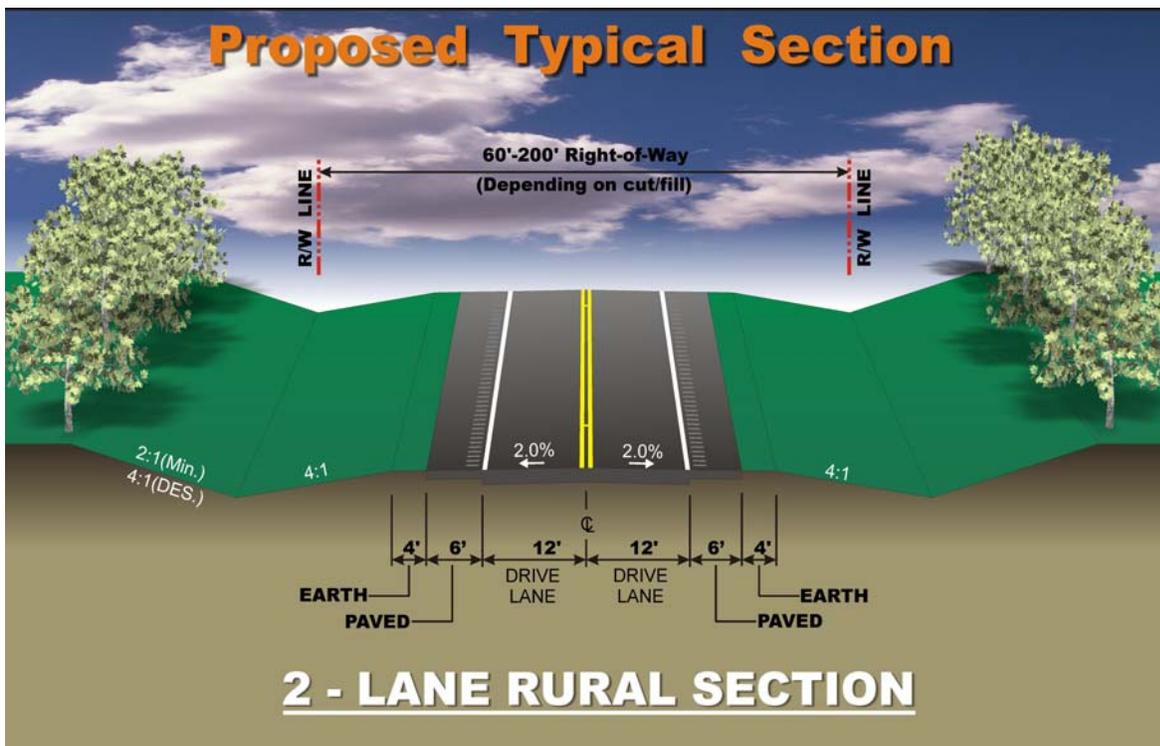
Analysis Section 1—Typical Section for Long-Term Reconstruction
